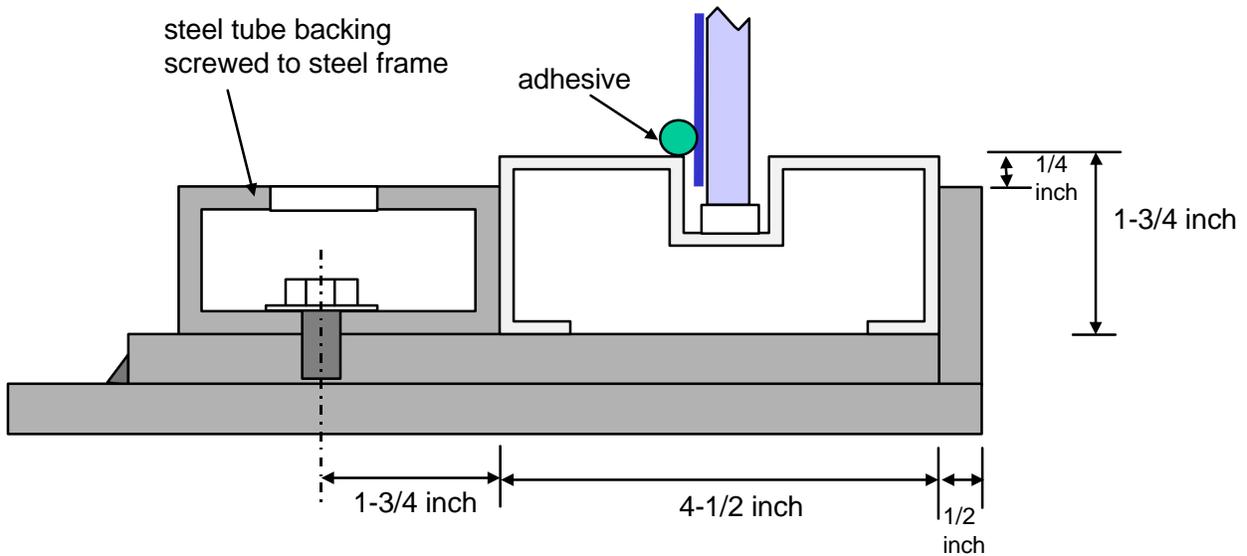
Aluminum frame mounting detail with a wet glazed film attachment.
